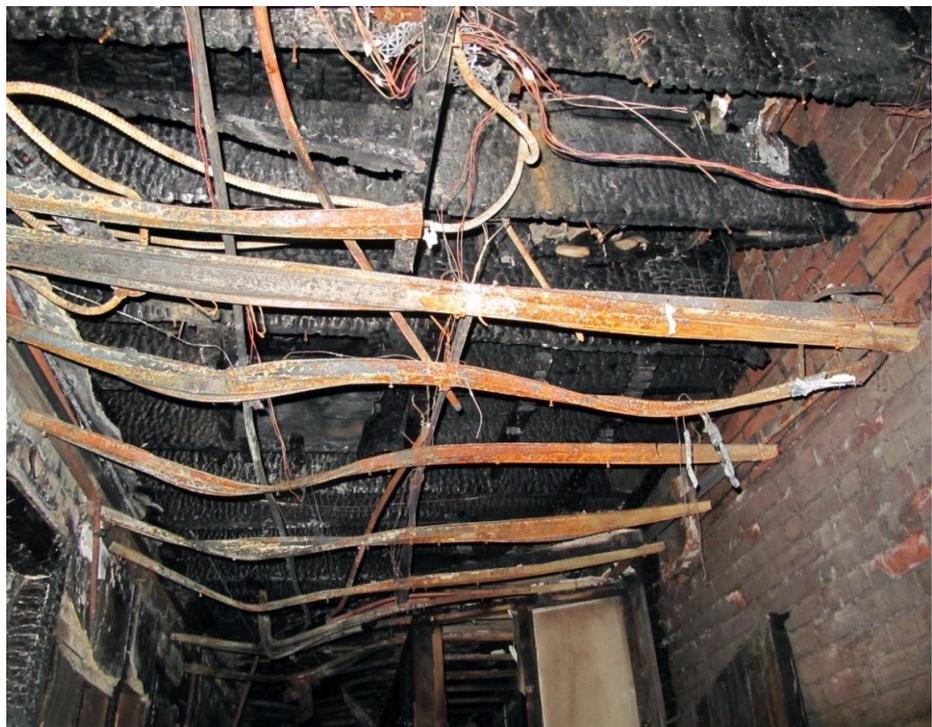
The suspended ceiling framework at the bottom of the stairway exposing heavily charred floor joists and the shaft opening.
